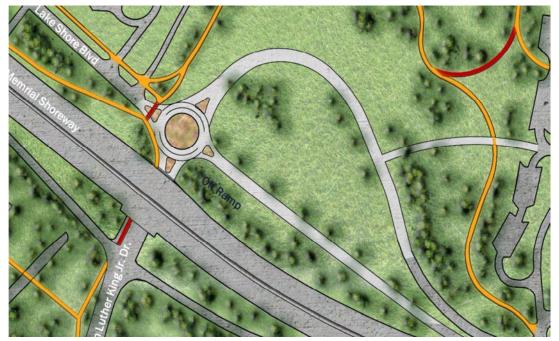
B: MLK DRIVE CONCEPT PLAN (LAKEFRONT GREENWAY)
